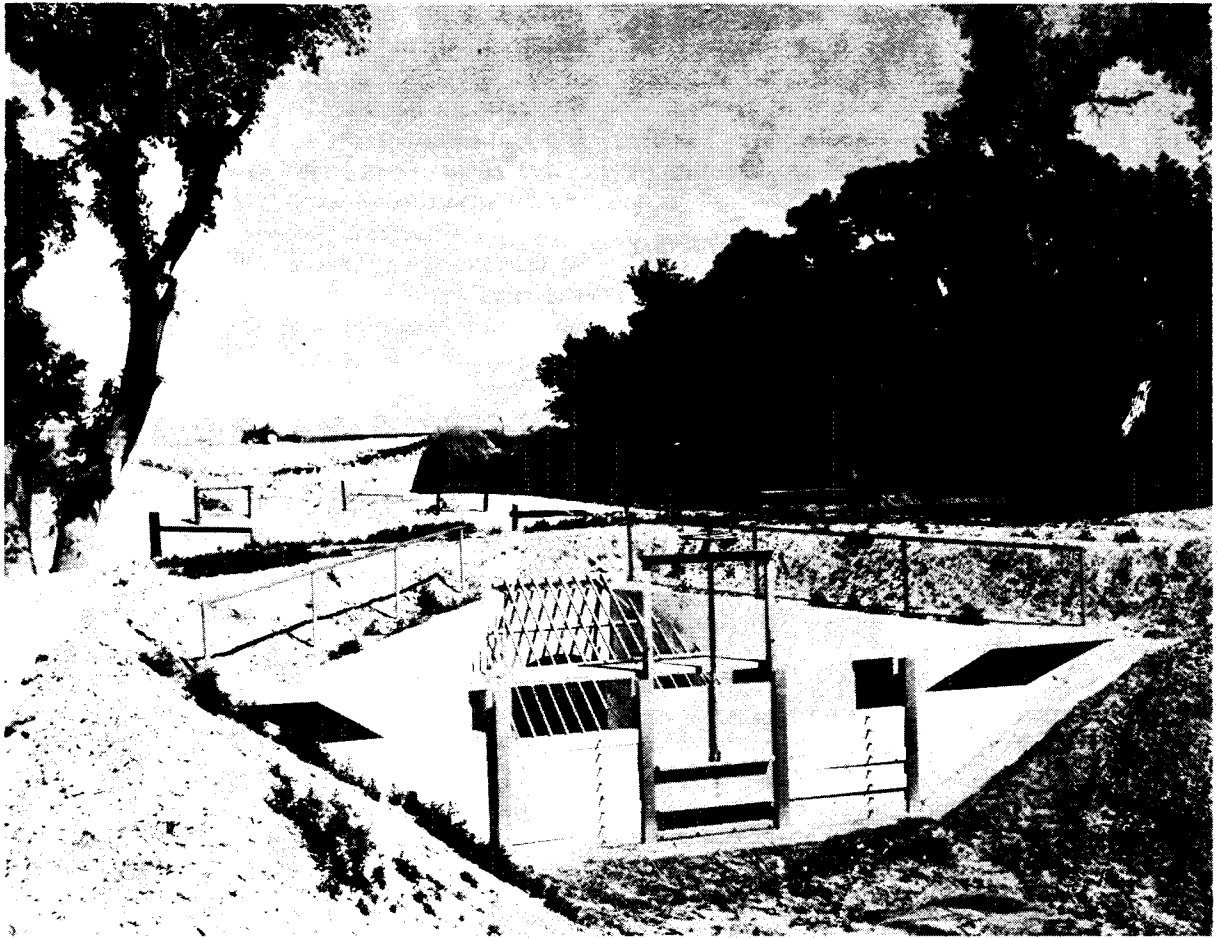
Check inlet to pipe structure. Adjustable weir installed in the stoplog groove. P 372-701-765
